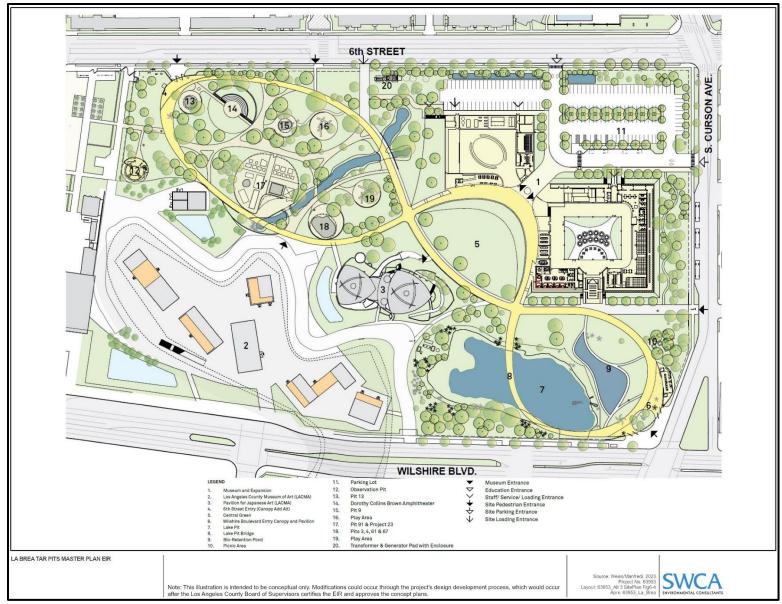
Refined Alternative 3: Hancock Park site plan.
